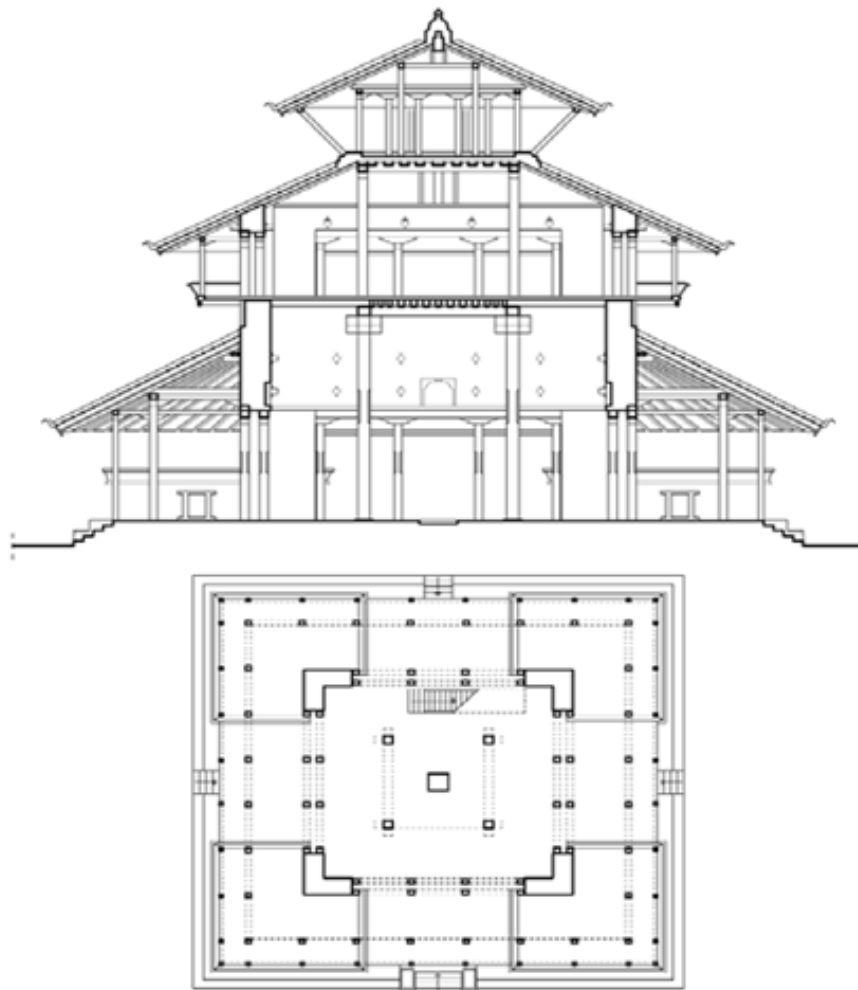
Ground floor plan (Bottom) & Section (top) of Kasthamandapa Source: (Bonapace and Sestini, 2003)
